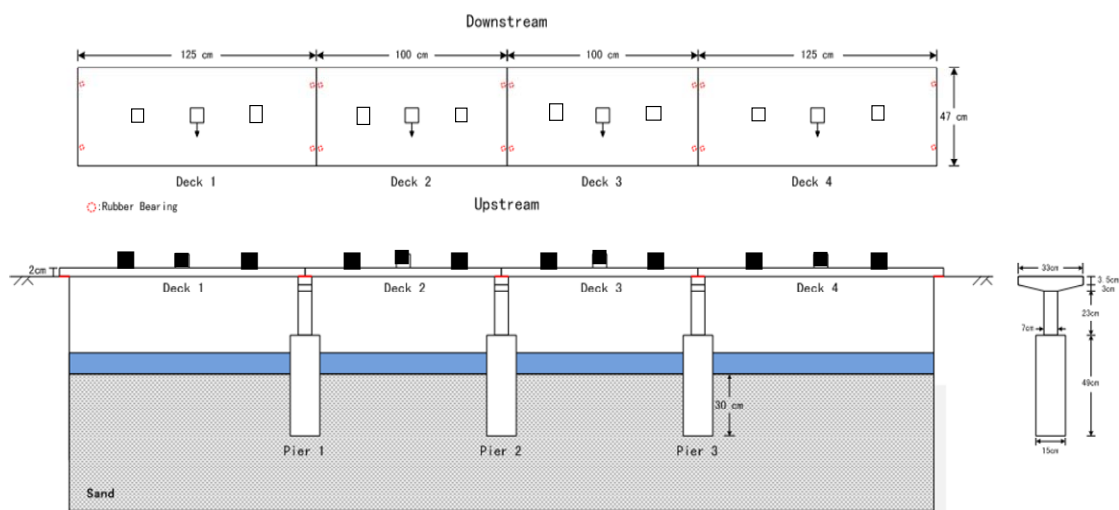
Sketch and dimension of the model bridge for testing. The locations of sensors on the deck are also shown.
